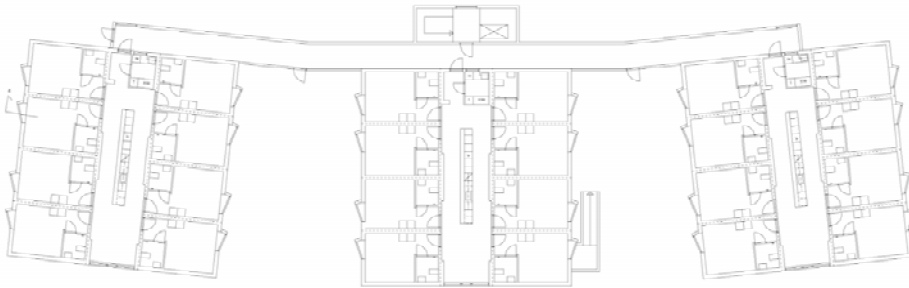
Layout for Vetenskapsstaden II, the 1st floor.
